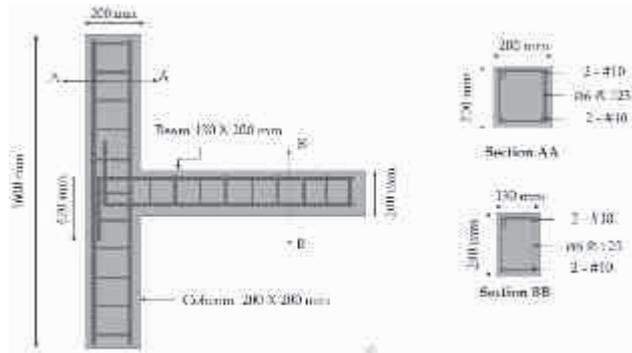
Structural Details of Monolithic Beam - Column Joint - MLJ 470
